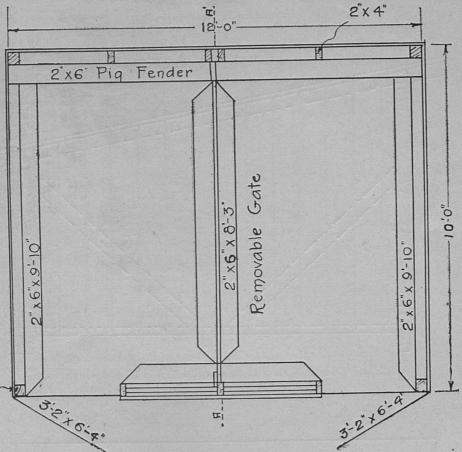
Two Pen Hog House, plan C 6-74-1, floor plan.
